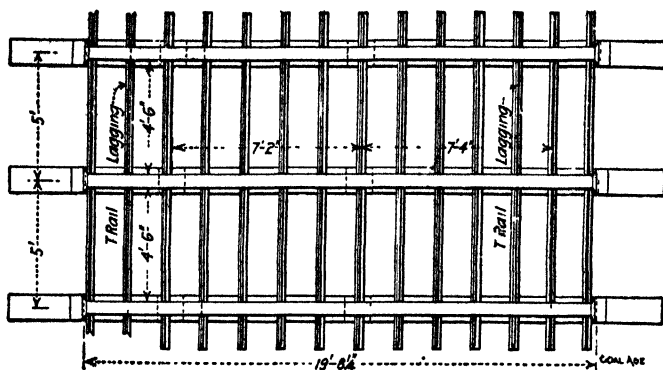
Plan of arches in Fig 8 showing T-rail reinforcing.
